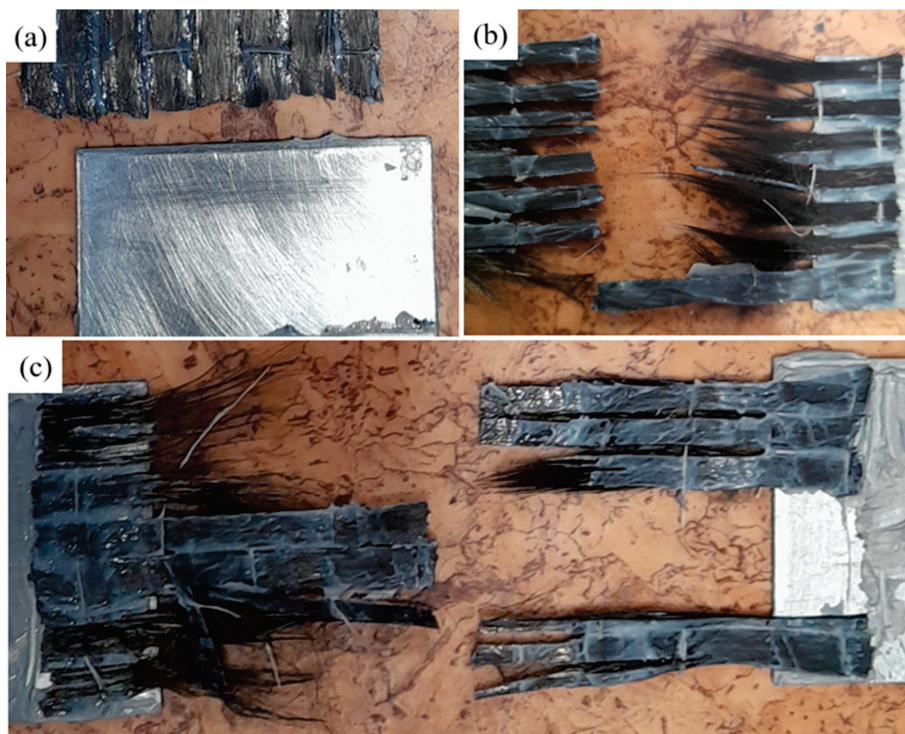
Observed forms of damage: (a) adhesive failure at steel/adhesive interface, (b) fabric rupture, (c) mixed failure.
